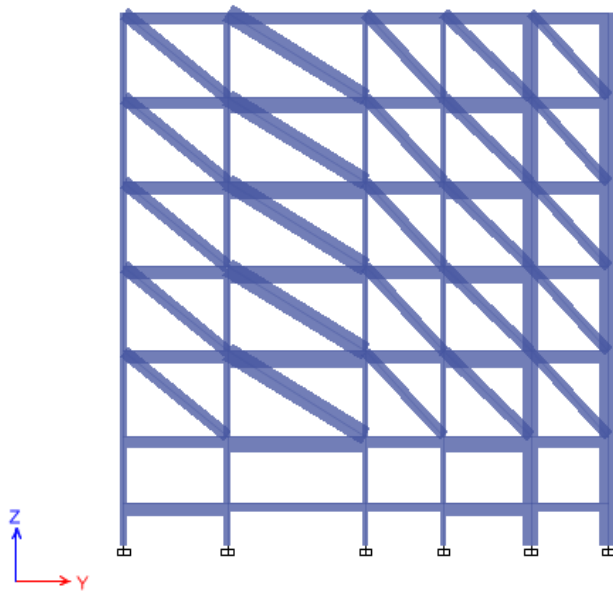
(d). Model 4, RC frame replaced by equivalent strut for fully infilled wall.
